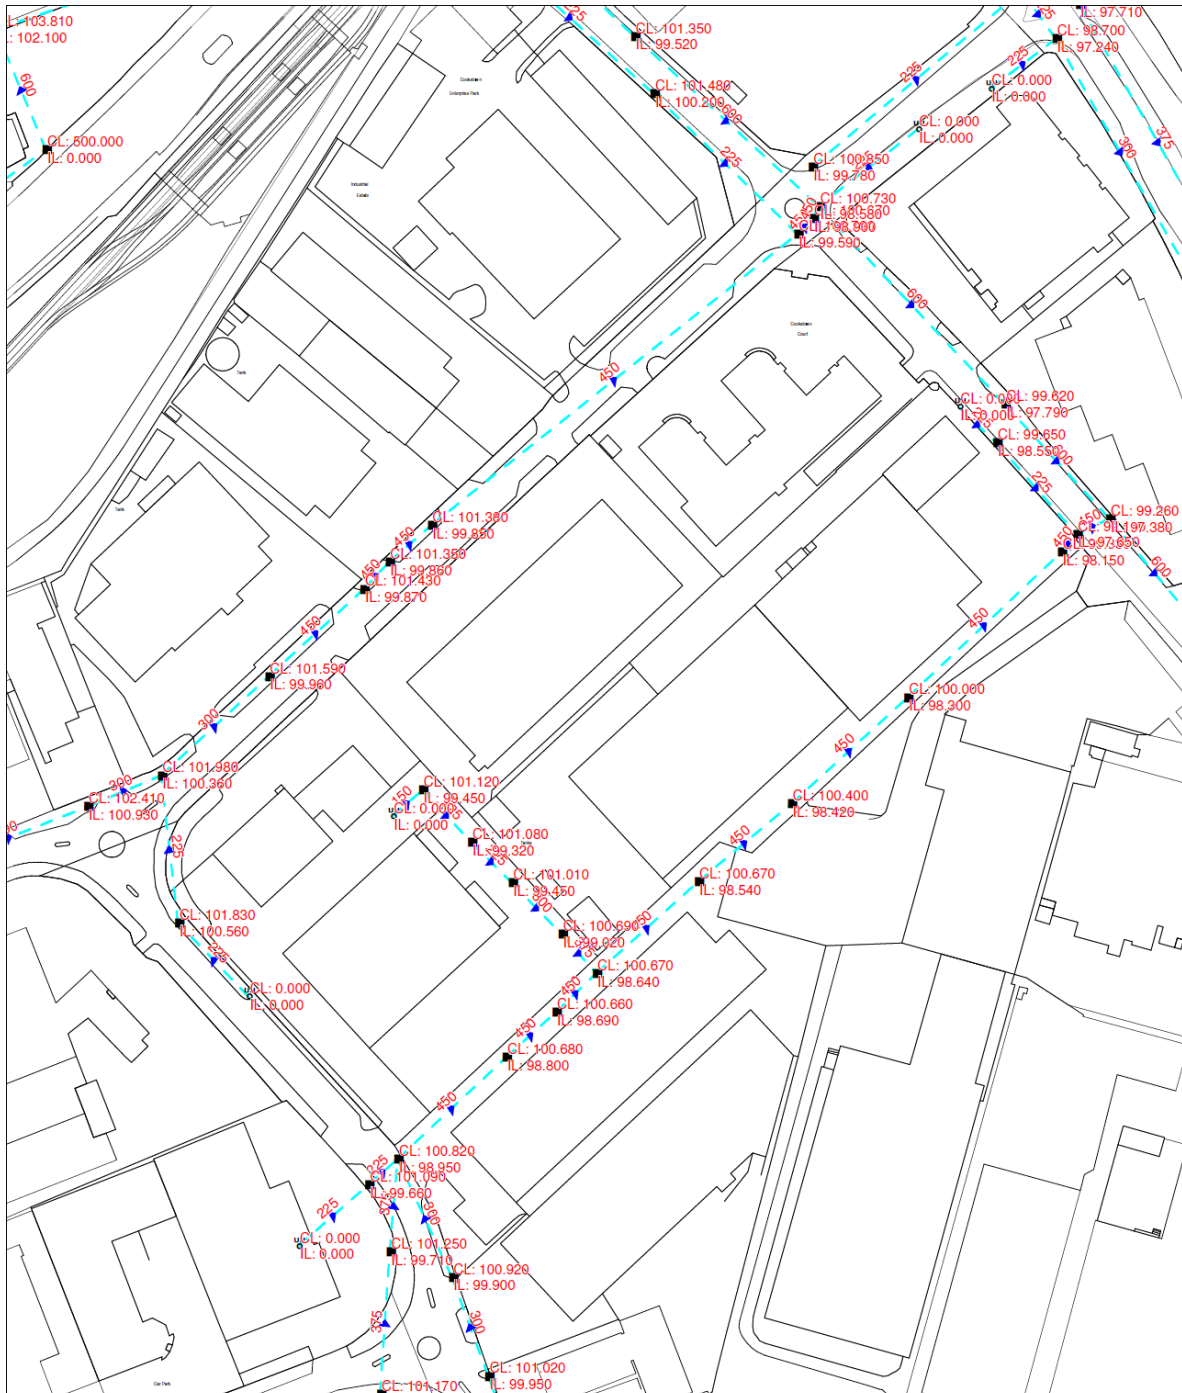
Map Extract from Irish Water Existing SW Drainage Plan
